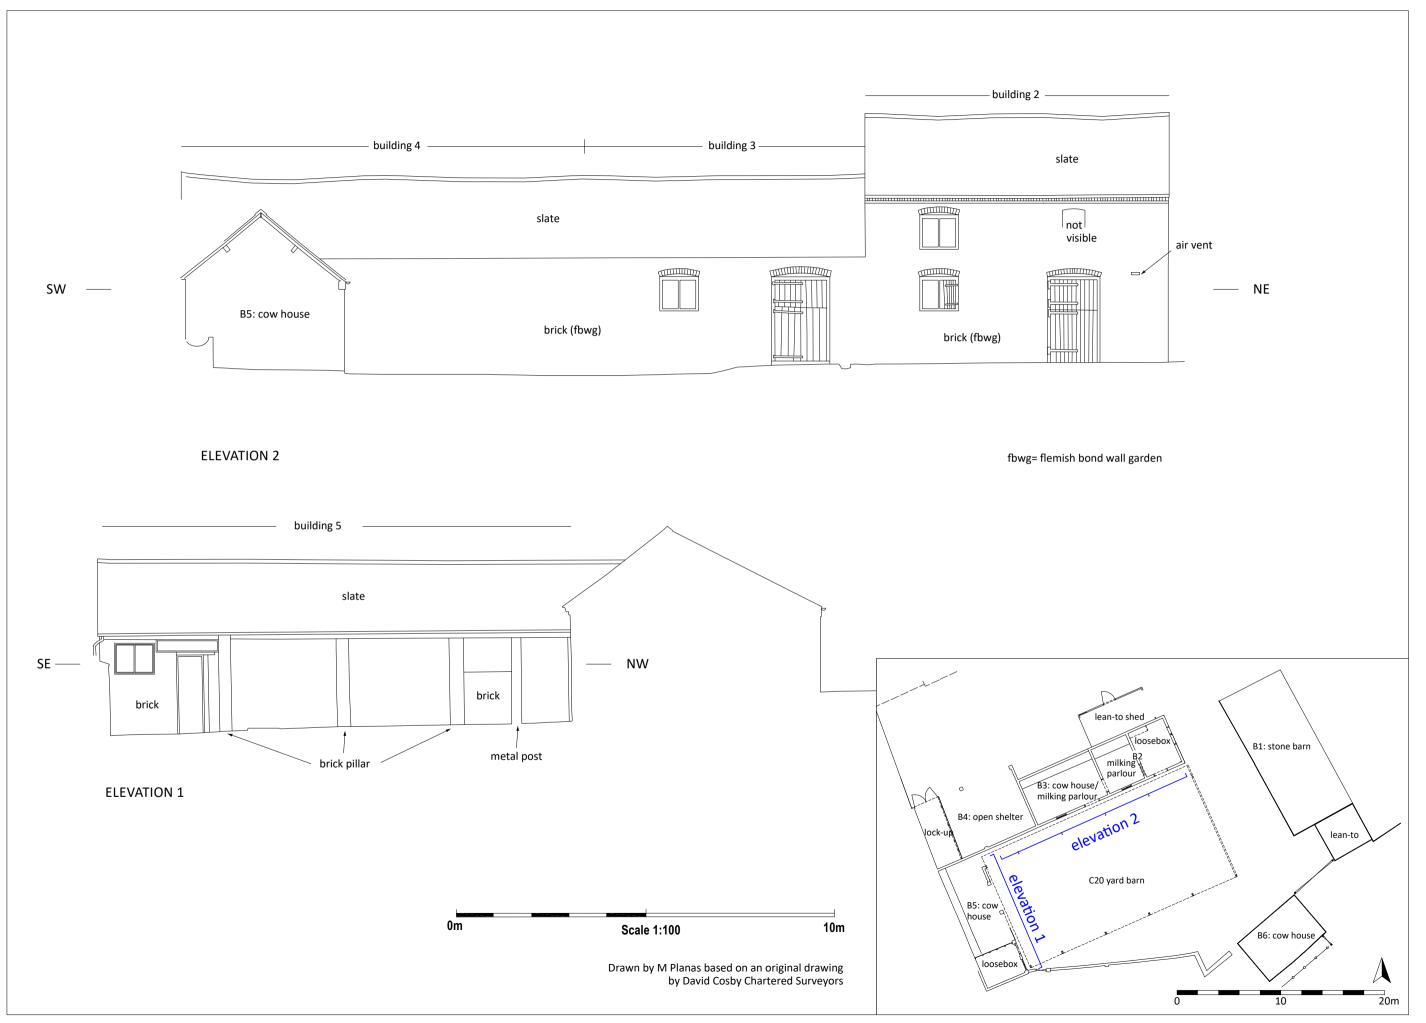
Buildings 2 to 5. Elevations 1 & 2
